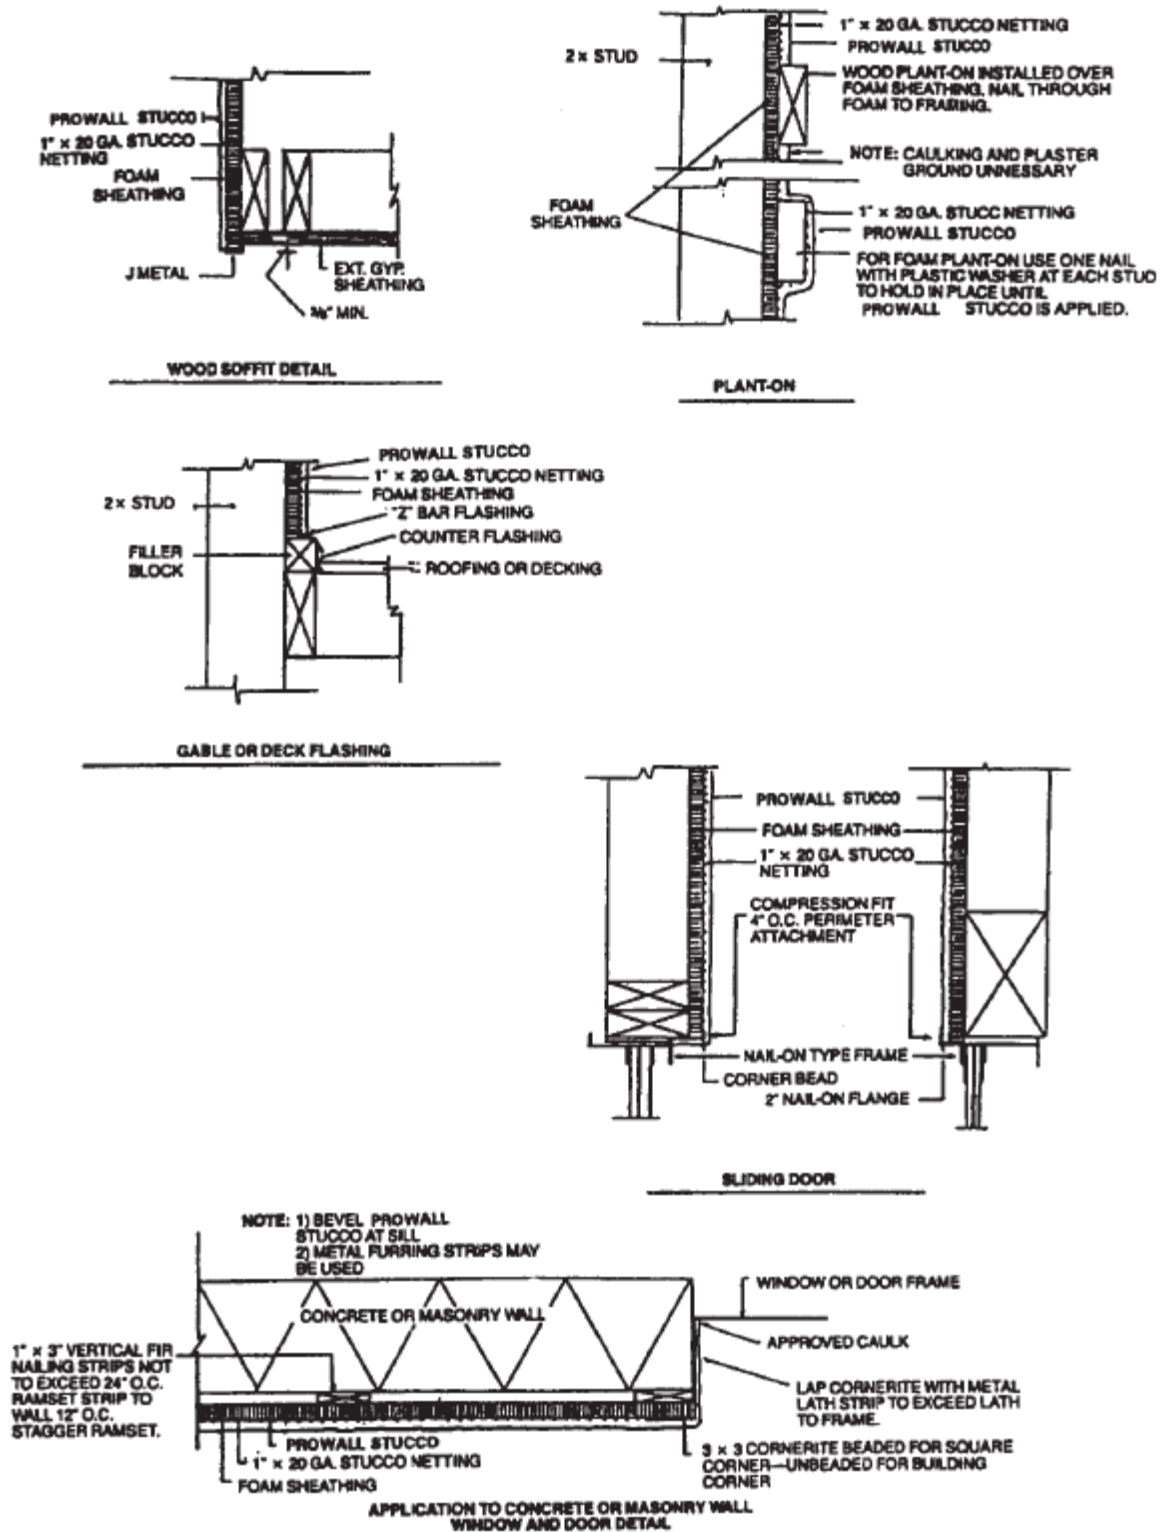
TYPICAL INSTALLATION DETAILS (Continued)
